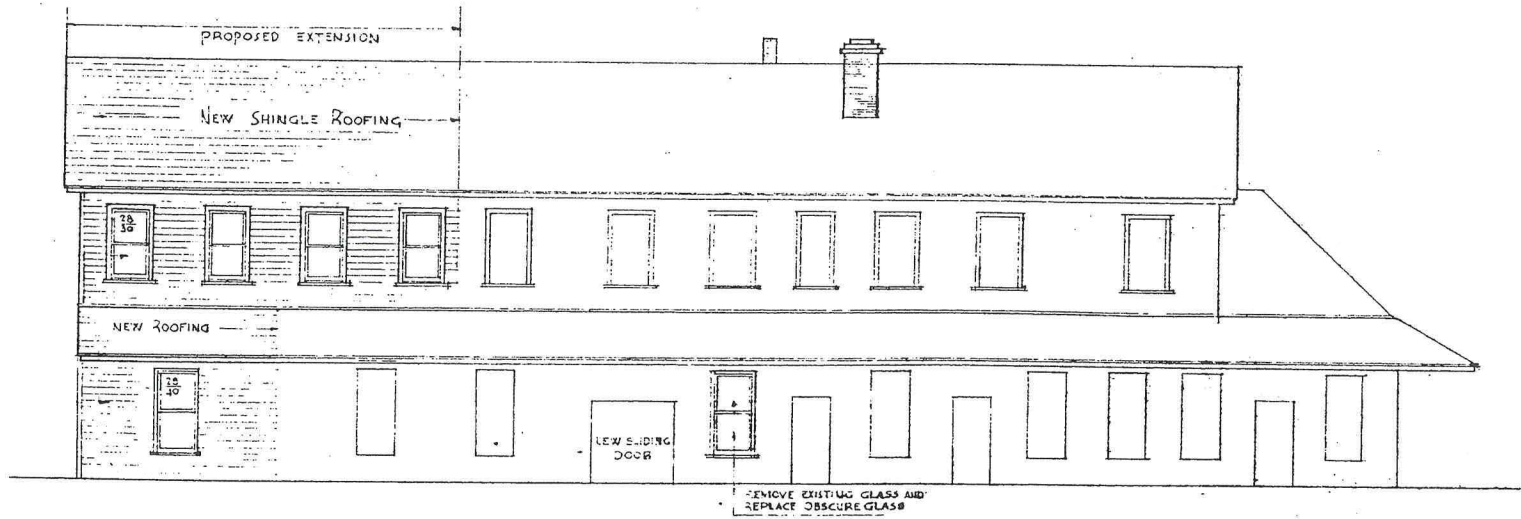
shows a new plumbing vent in the roof immediately left of the chimney, just above the men's washroom area.
